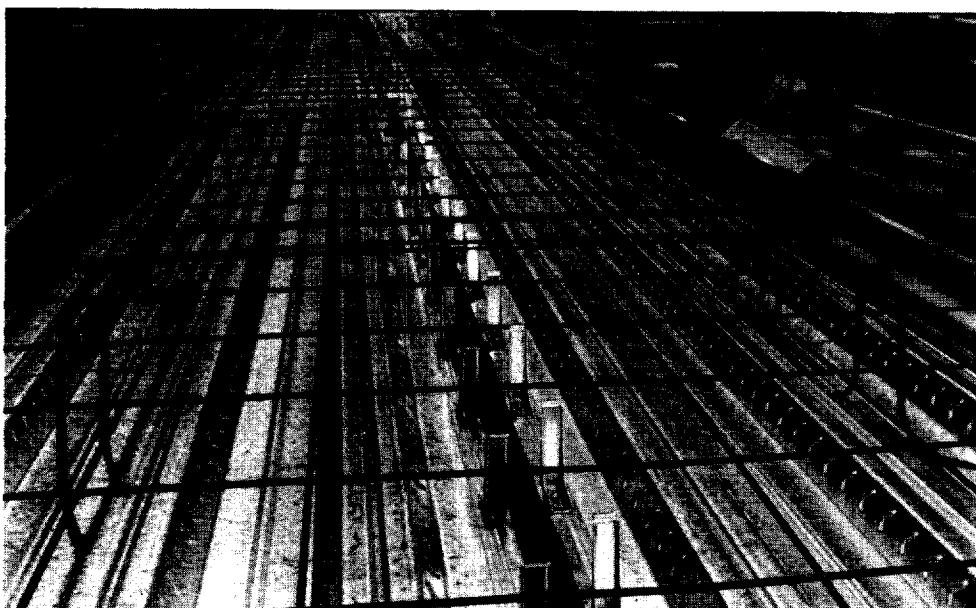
Hilti HVB shot-fired shear connectors attached to steel beam
